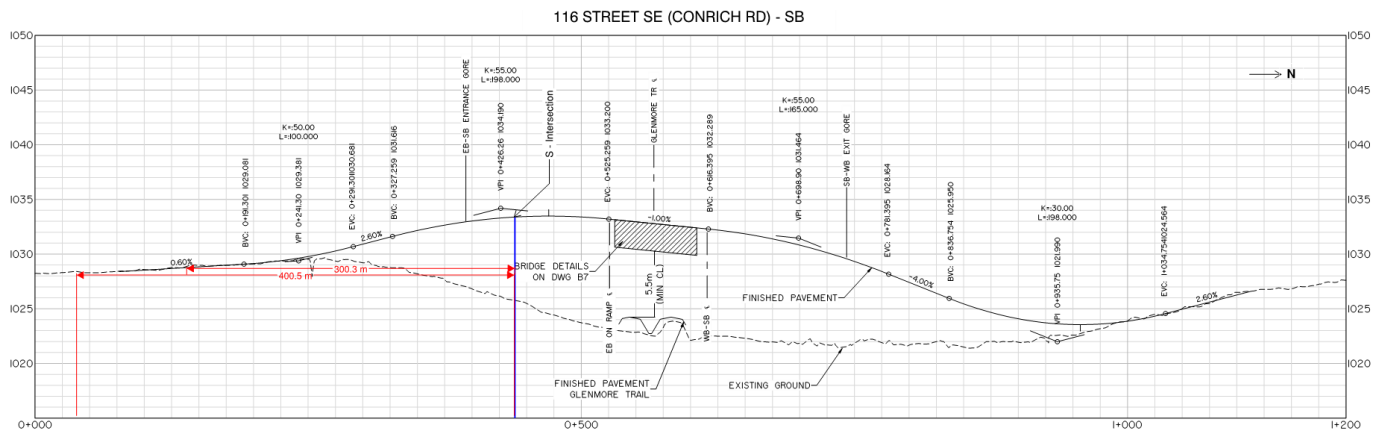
116 Street SE (Conrich Road) Proposed Southbound Road Profile
